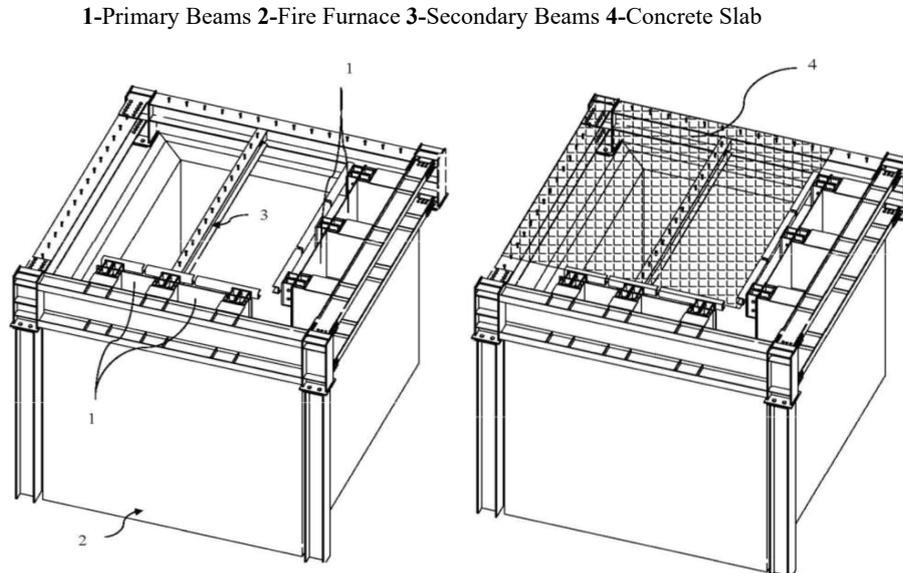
CAD drawings of 4.3 m x 3.8 m sized steel – concrete composite floor system on the fire furnace (a) without concrete slab, (b) with concrete slab
